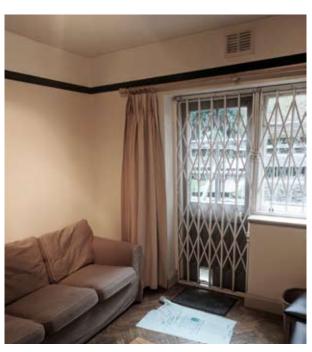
Existing door and sidelight removed, wall knocked through under window cill. Wall to left-hand-side of opening knocked through. Wall between kitchen (LG05) and living space (LG04) knocked through.
